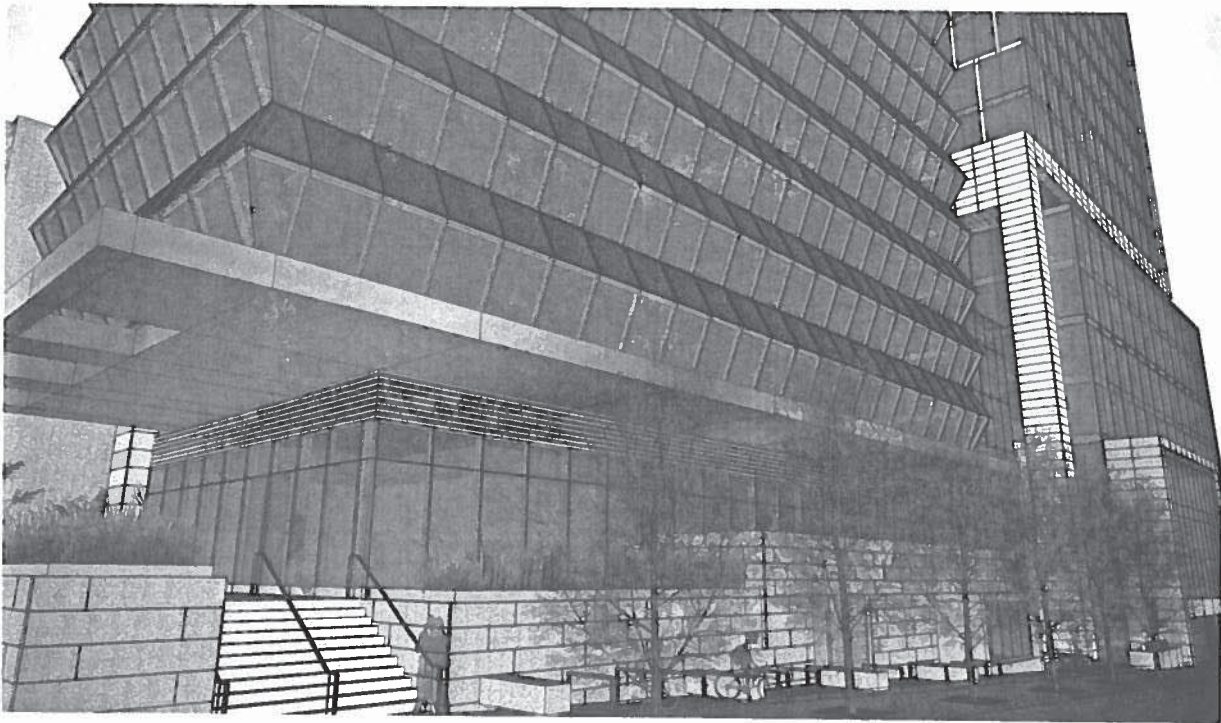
Hollis Street facade of the hotel, hotel plaza, terraces and widened sidewalk.
